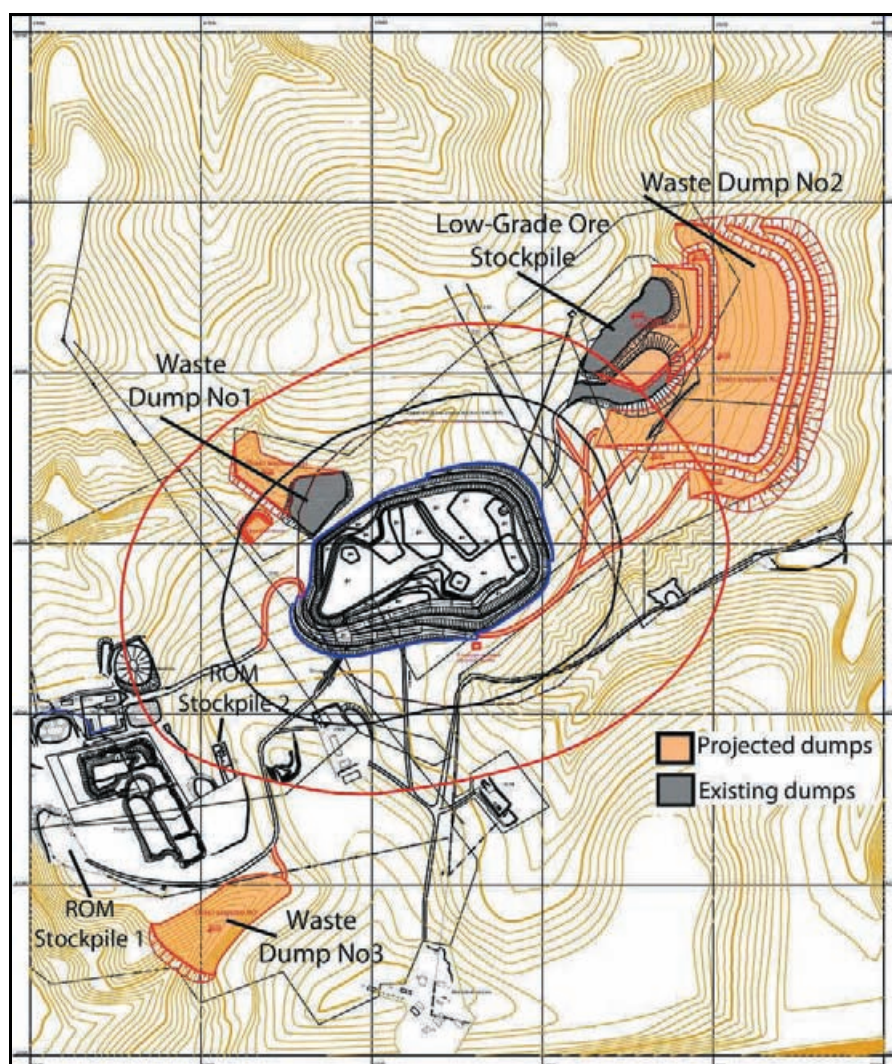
ROM, Low-Grade Ore Stockpiles and Waste Dumps Location Plan
